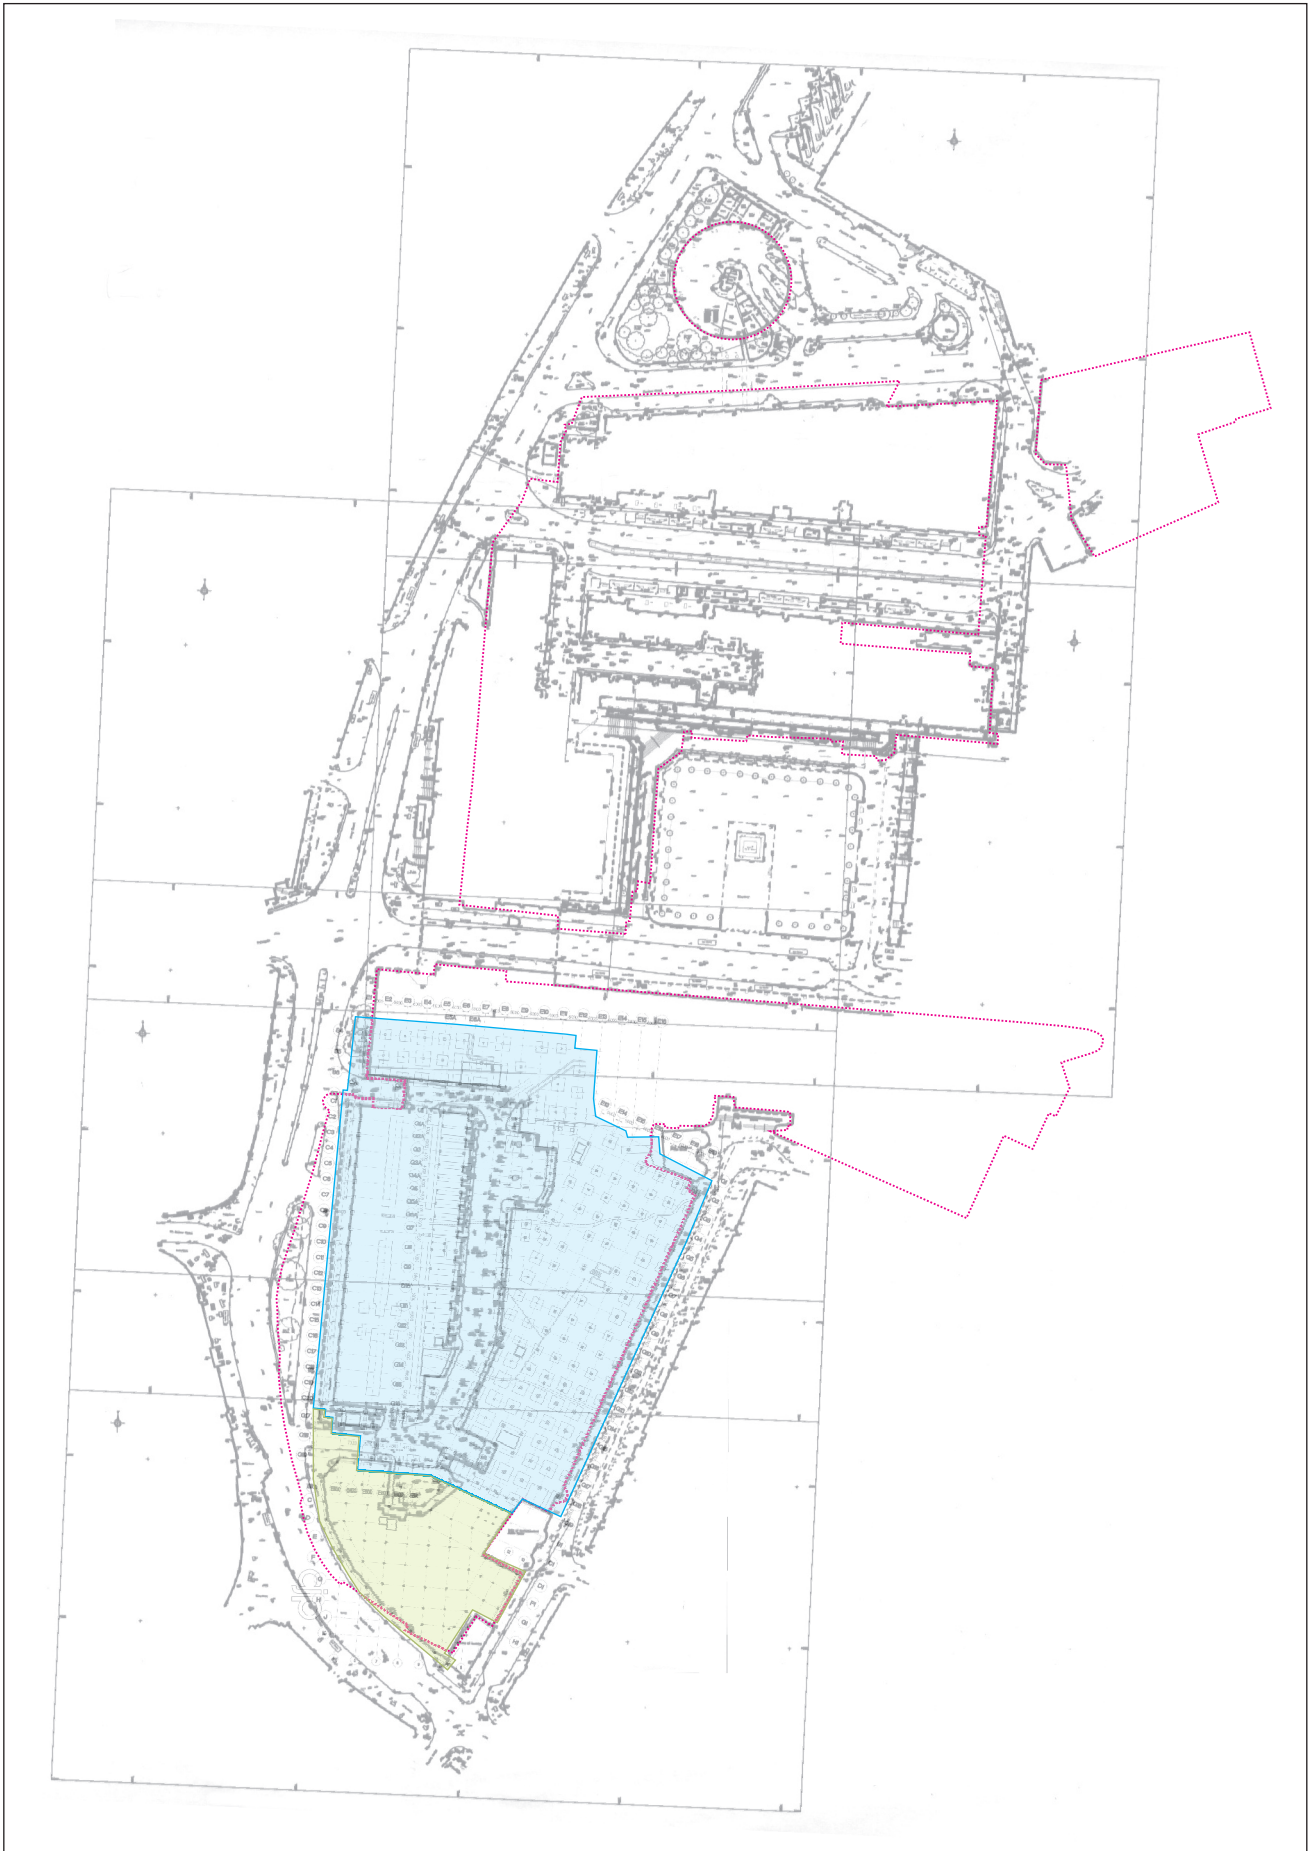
Recently surveyed plan of the development area showing modern foundations within the Southern Gateway area (destructive foundations shaded blue; potentially less destructive foundations shaded green; proposed development area outlined red).
